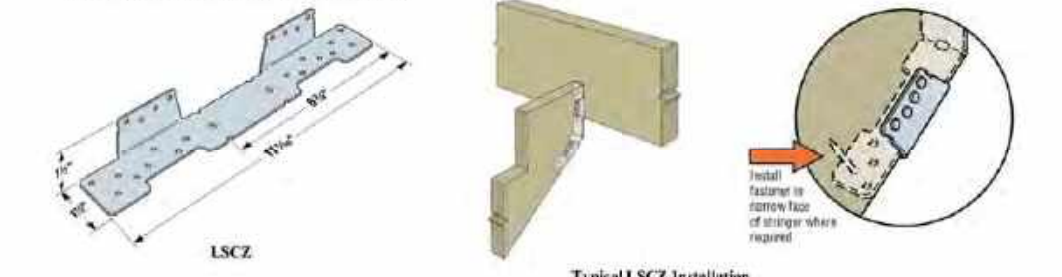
LSCZ ADJUSTABLE STRINGER CONNECTOR
